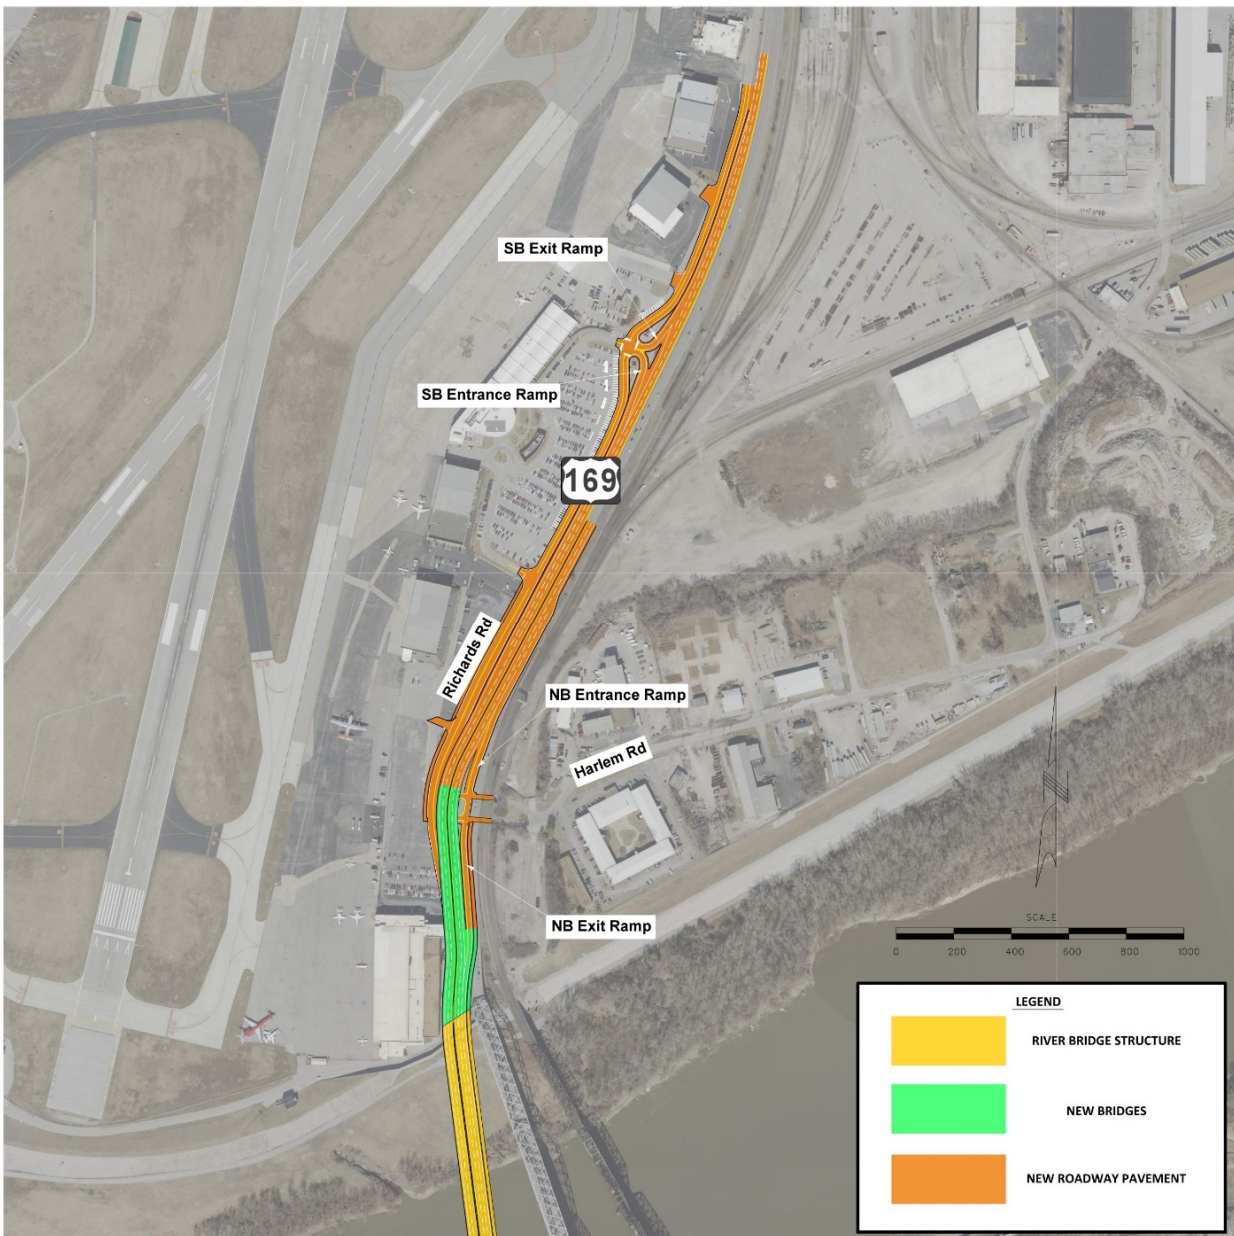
Proposed Central and Harlem Road Access Improvements
